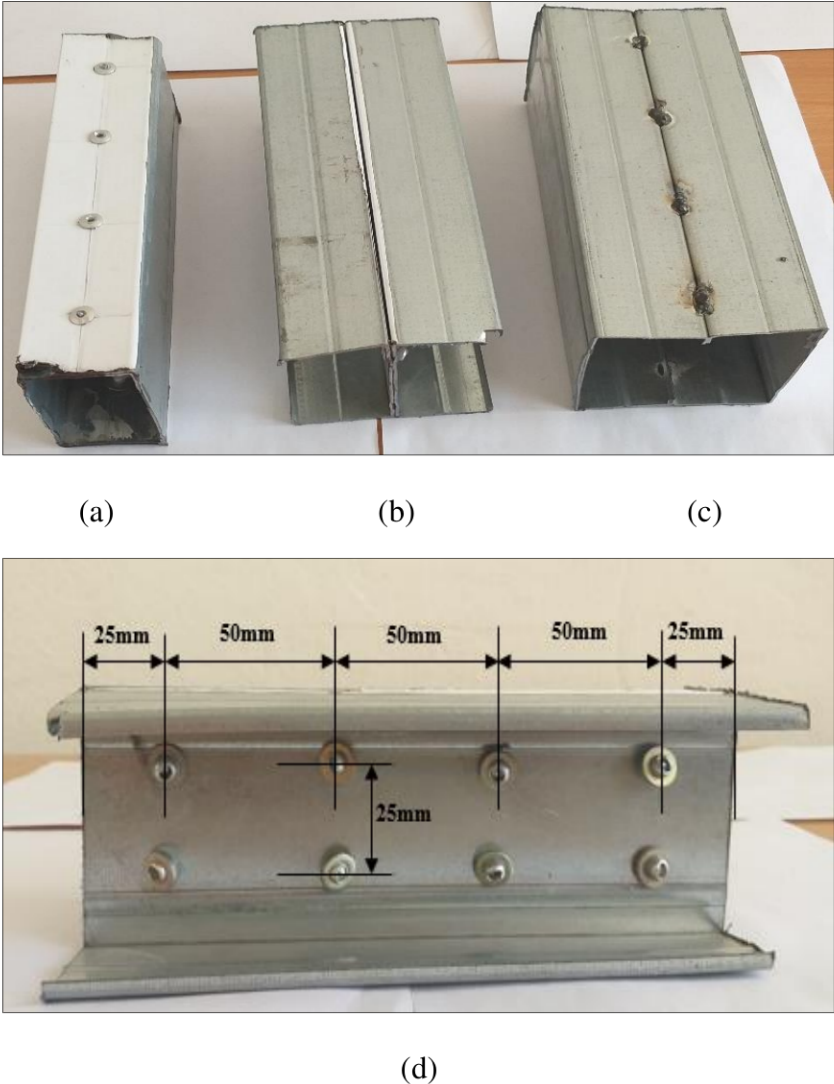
Cold-formed steel built-up unfilled columns: (a) Box; (b) Back-to-back; (c) Face-to-face; (d) Back-to-back longitudinal view.
